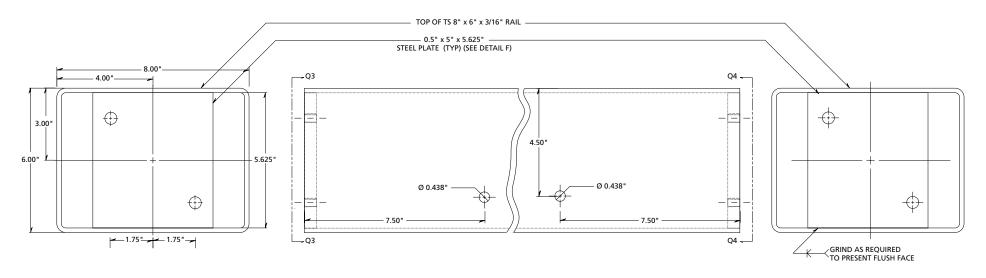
" x 6" STEEL RAIL PLUG SCHEMATIC ASSEMBLY
